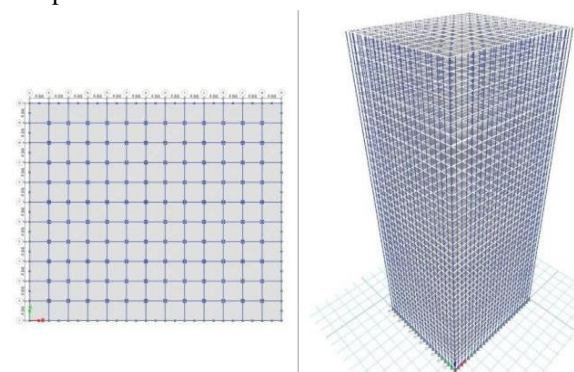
Plan view and 3-Dimensional view of rectangle - Shape model
